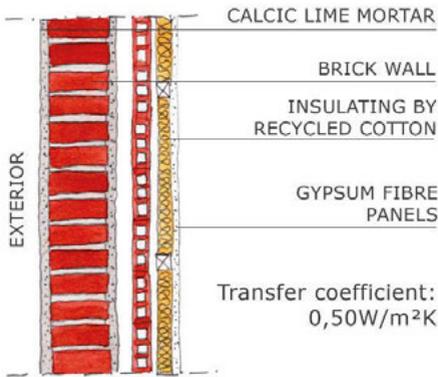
Exterior brick walls details, section (Source: Li Puma, 2021)
